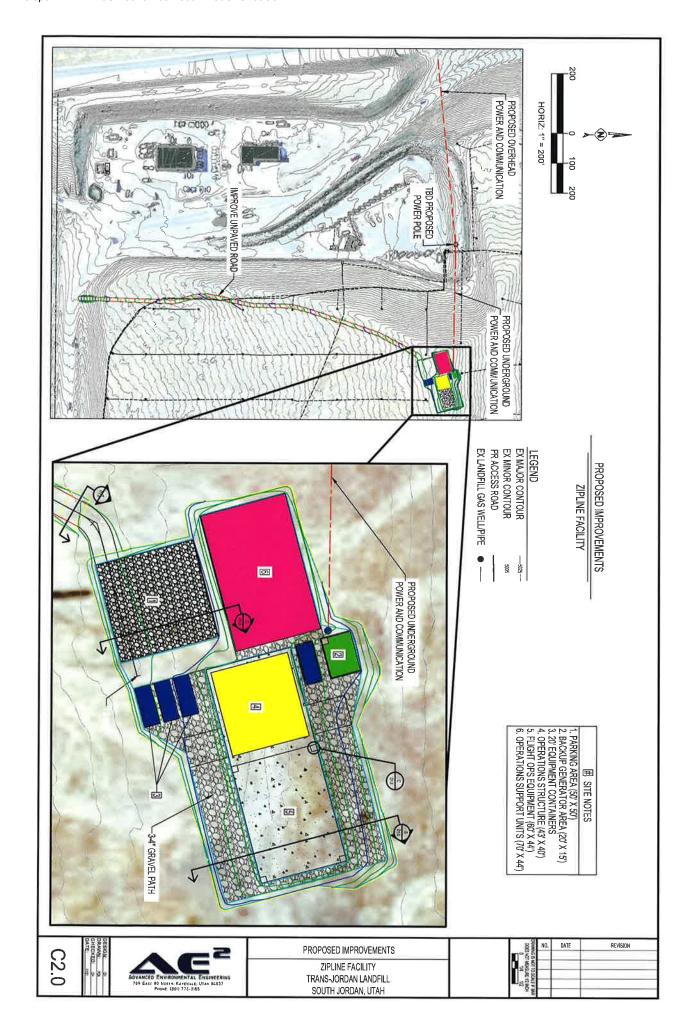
EXHIBIT C TENANT'S BUILD-OUT PLANS AND SPECIFICATIONS
